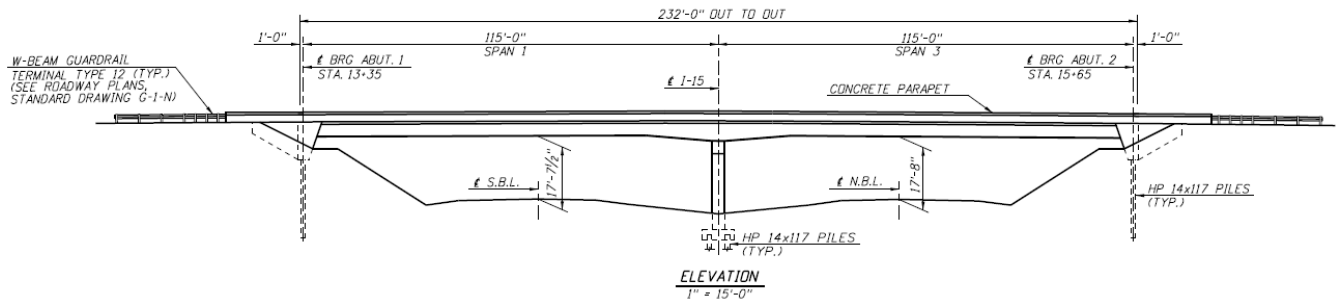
Elevation View of the SH-22 over I-15 Bridge at Dubois (NTS)
